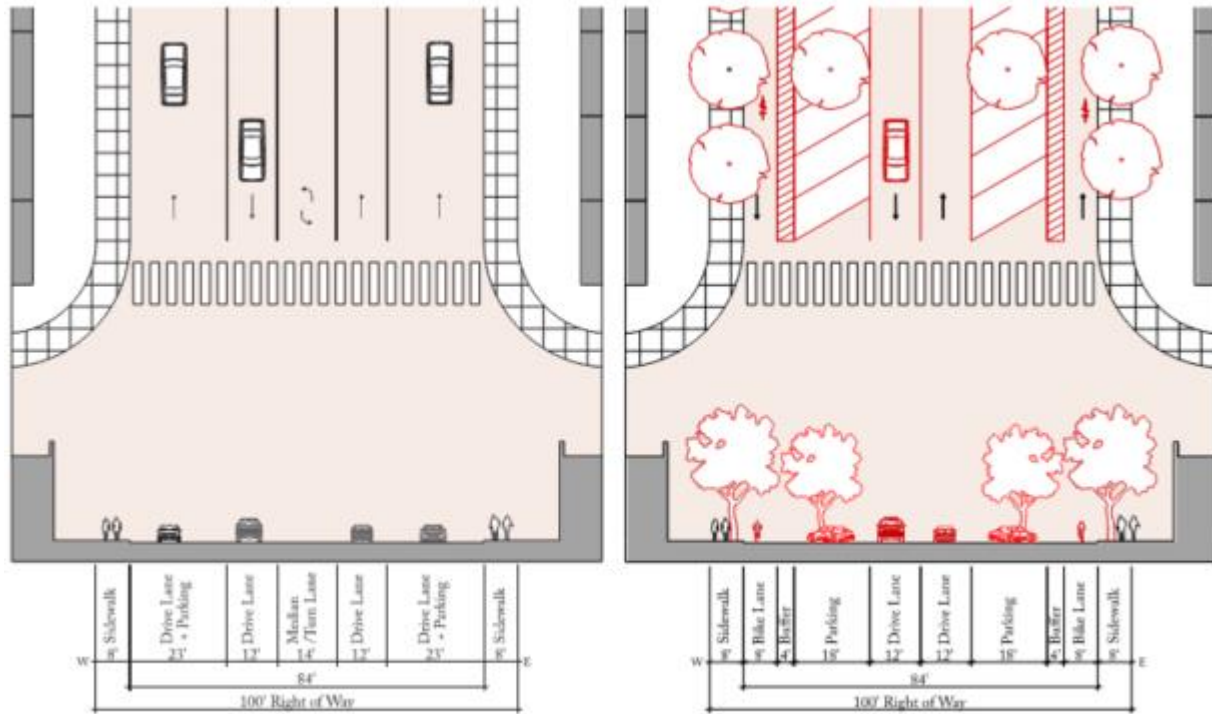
Whittier Boulevard -- Garfield Avenue to Montebello Boulevard
